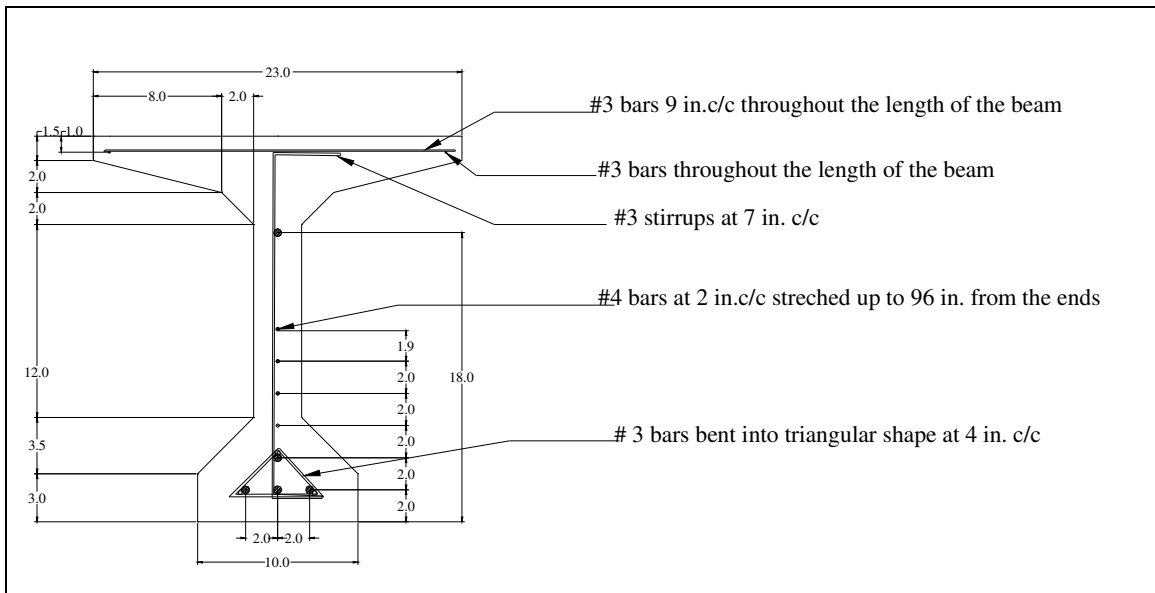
Cross-section and Reinforcement details of I-shaped beams
